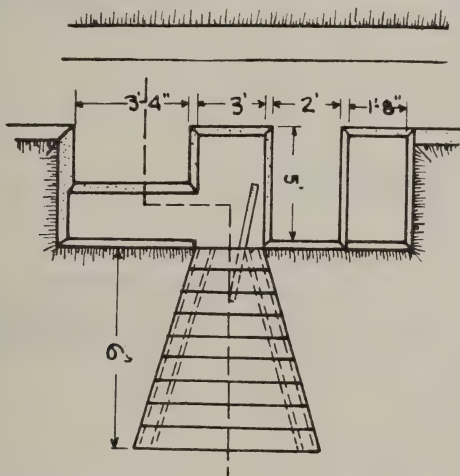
Plan of machine-gun emplacement, with movable light head cover.
